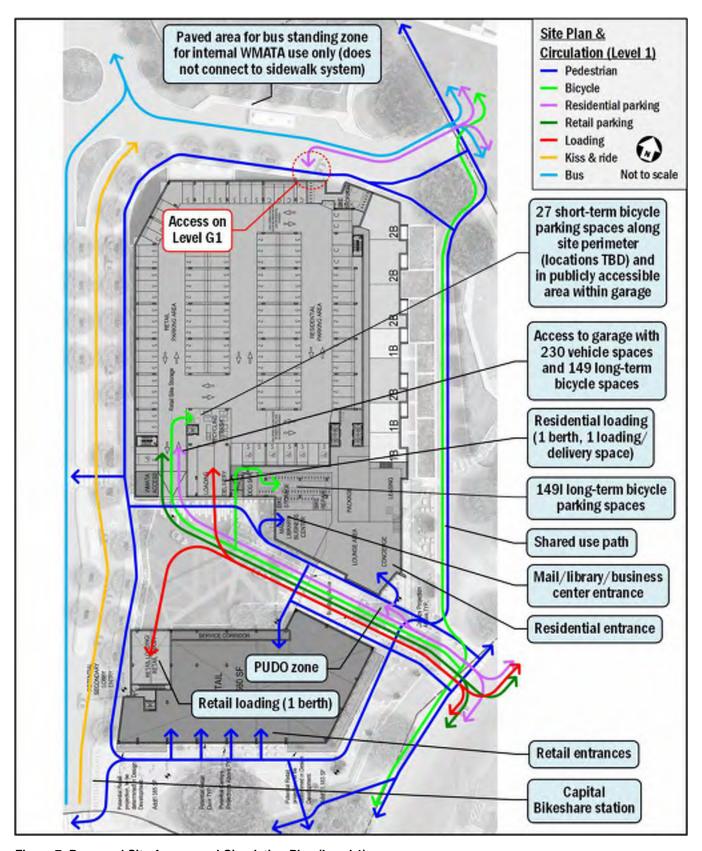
Proposed Site Access and Circulation Plan (Level 1)
